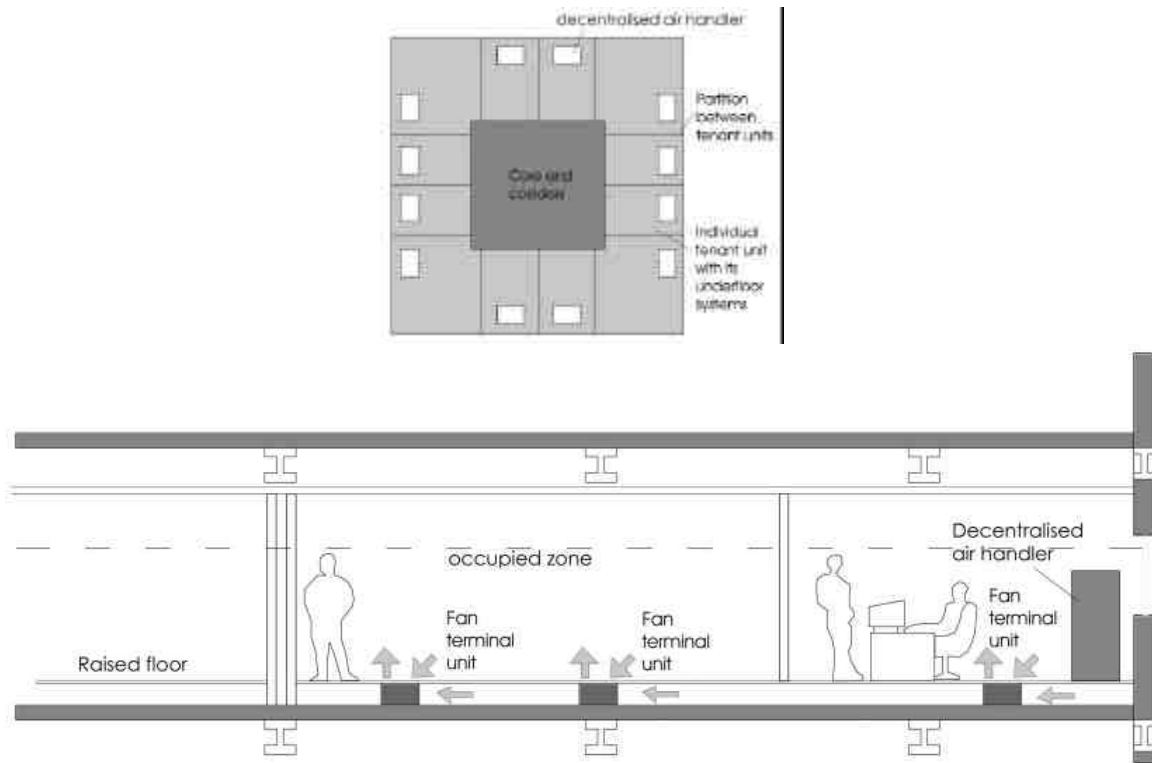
Underfloor air conditioning system with decentralised primary air handlers
